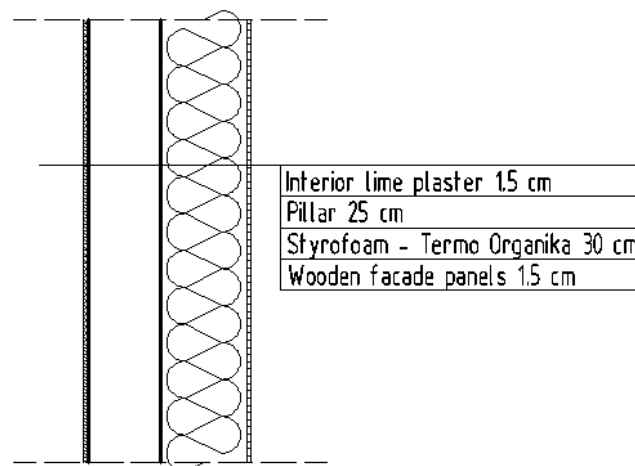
Structure of the exterior wall with concrete column covered with panels.
